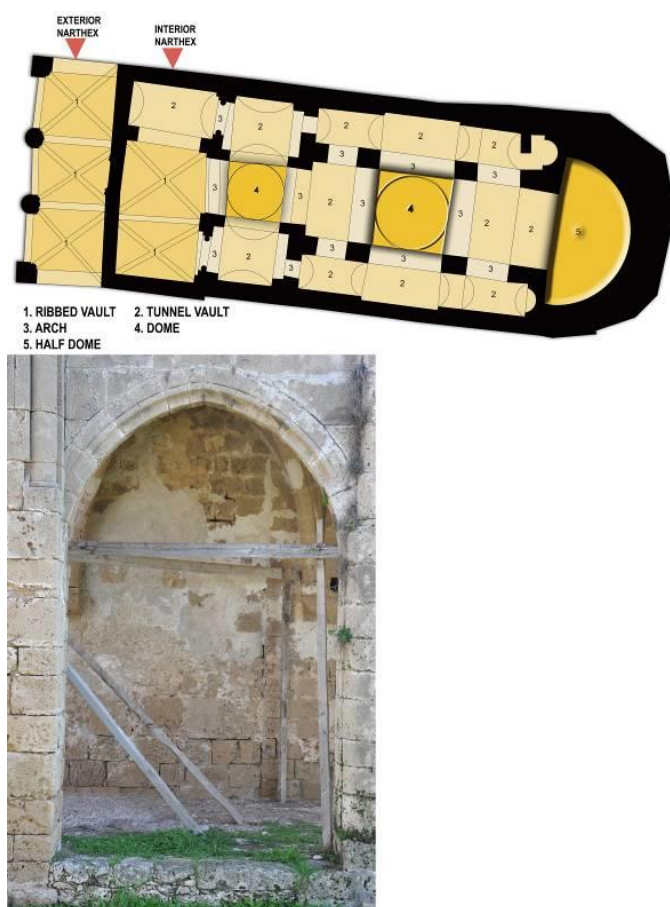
(a) Survey drawing of the church building, ceiling plan (b) Image of the exterior wall from narthex
